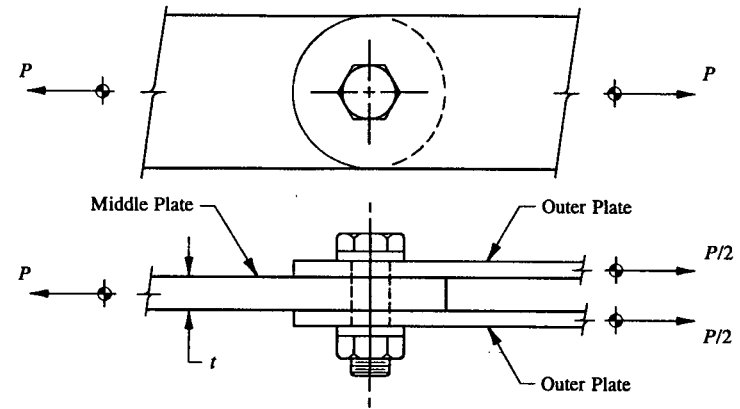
Double-shear lap joint loaded by a tension load  $P$ .
